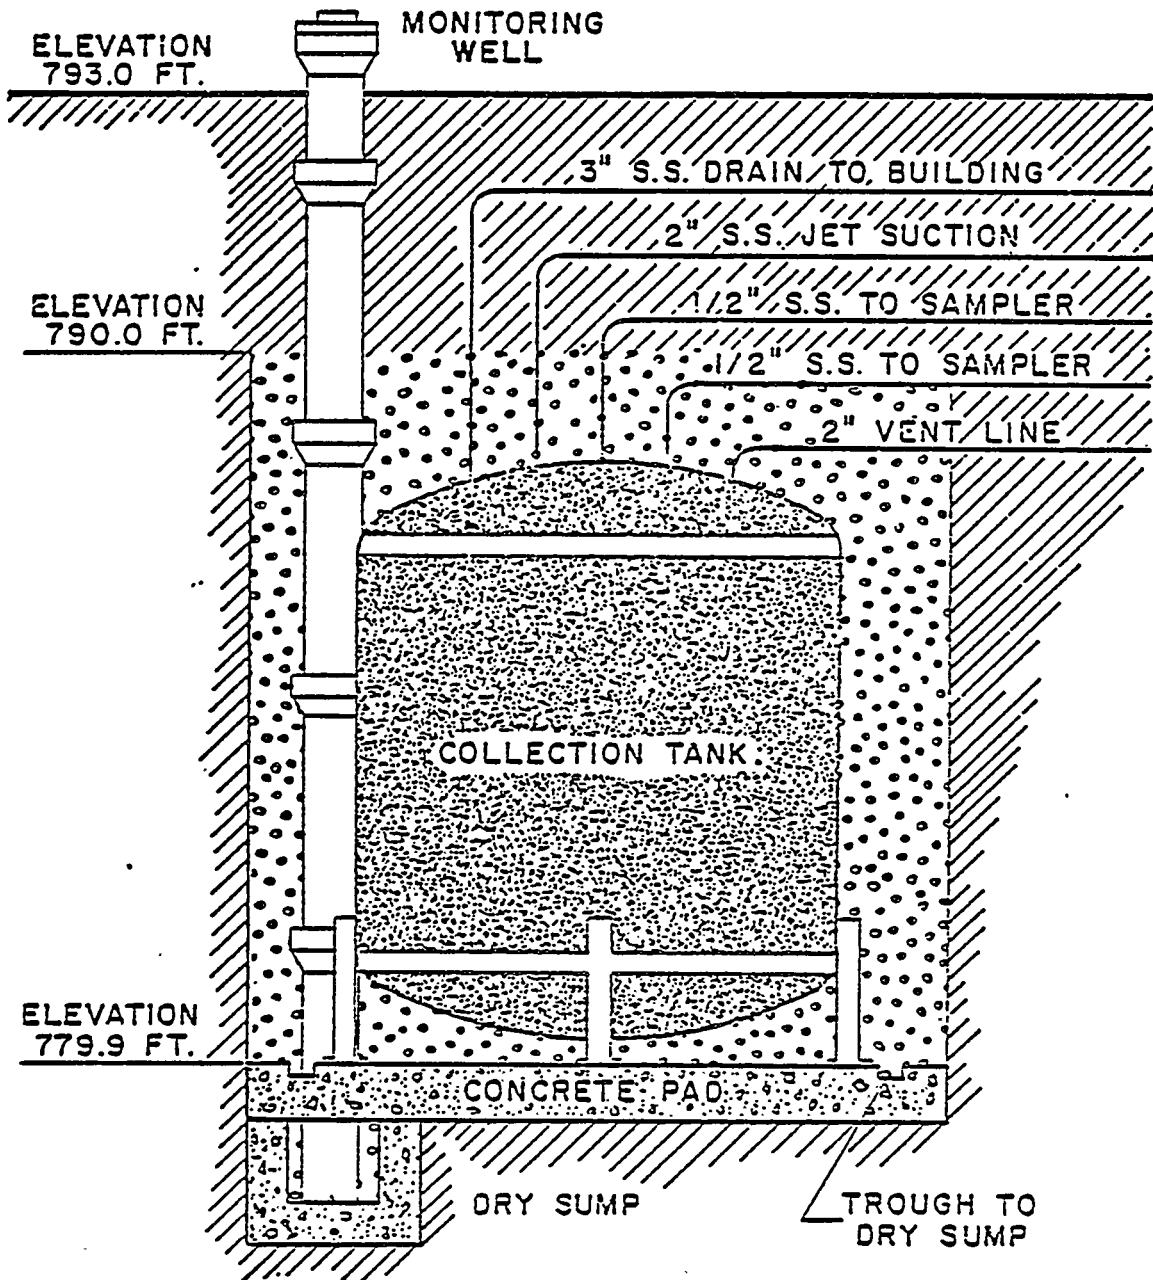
TYPICAL OLDER COLLECTION TANK INSTALLATION IN BETHEL VALLEY
